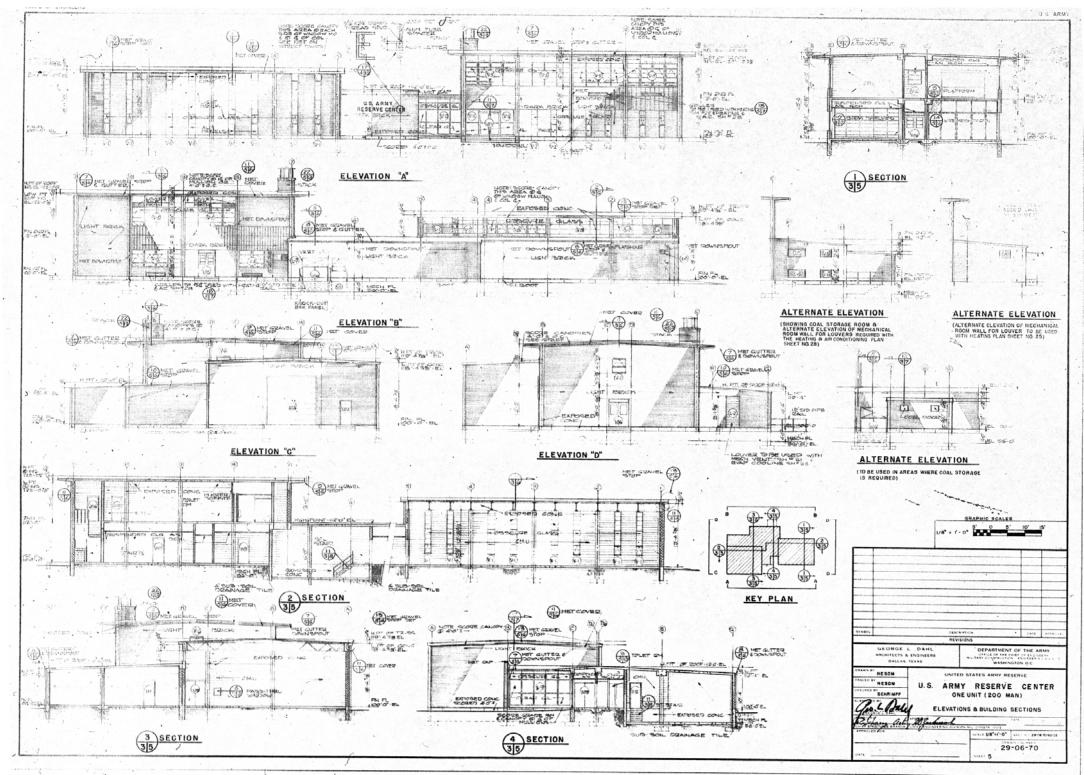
Standard plan for a One Unit (200-man) USARC, George L. Dahl, 1960 (courtesy of the USACE Archives, Alexandria, VA, Box 29, File 29-06-70).
